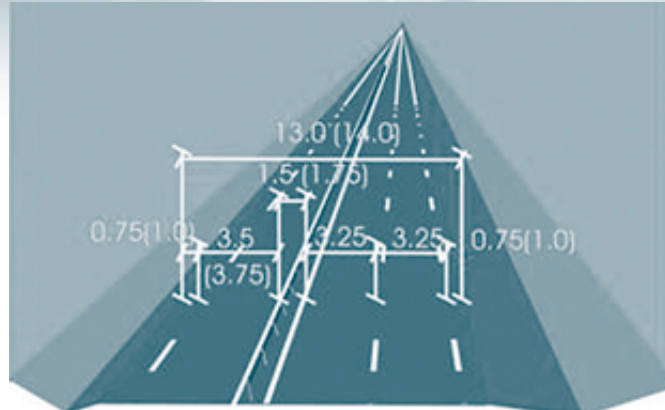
Proposed standard 2+1-cable barrier cross section with existing 13-m (14.2-yd) roadway. (SNRA)
